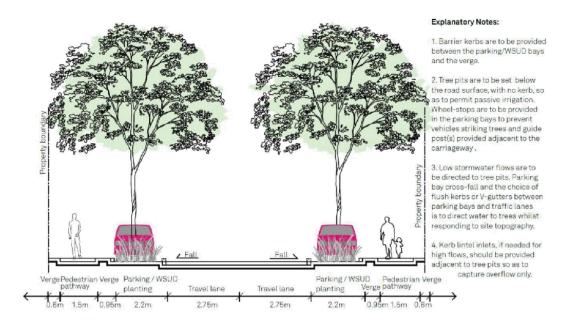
Typical local street Travel lanes have been slightly narrowed (3.0m to 2.75m) compared to previously exhibited version to provide sufficient space in the verge for utility allocations (requires 3.0m on each side of the street). Travel lane widths still provide sufficient space for two cars, or a car and a truck to pass unimpeded. Explanatory notes for design considerations have also been provided.
